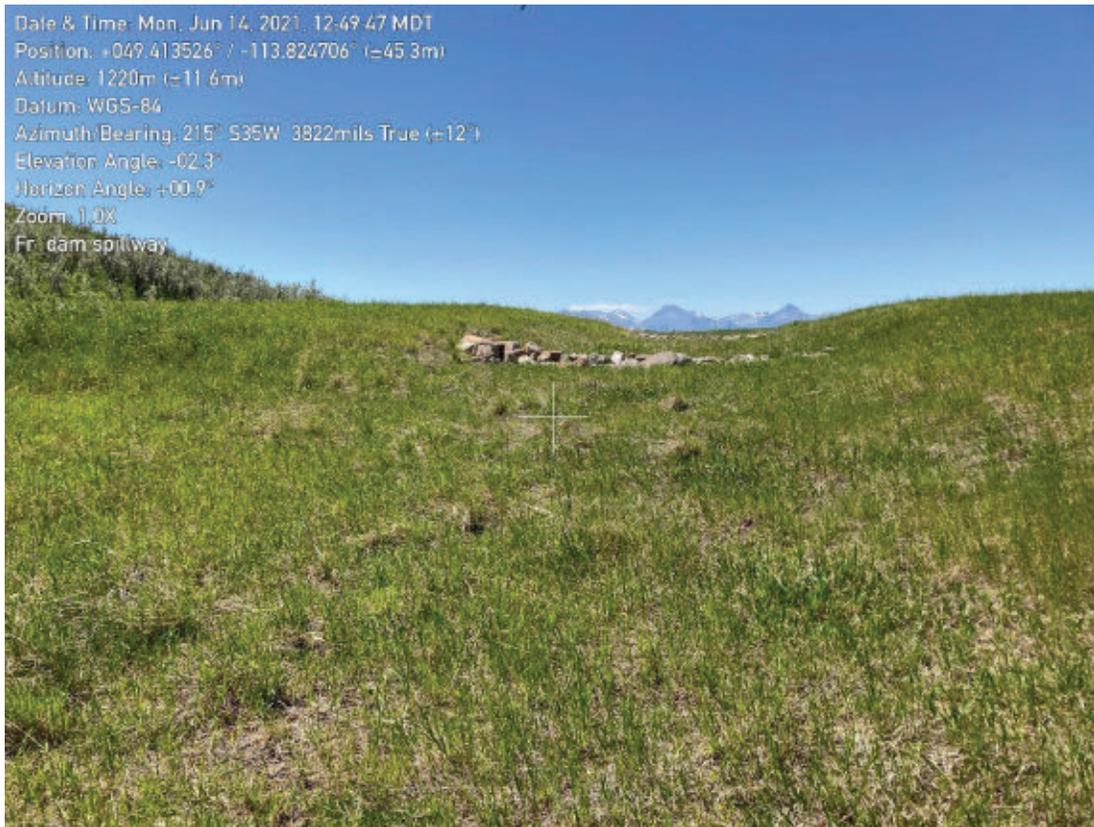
Therriault Dam emergency spillway looking upstream (14 June 2021)
